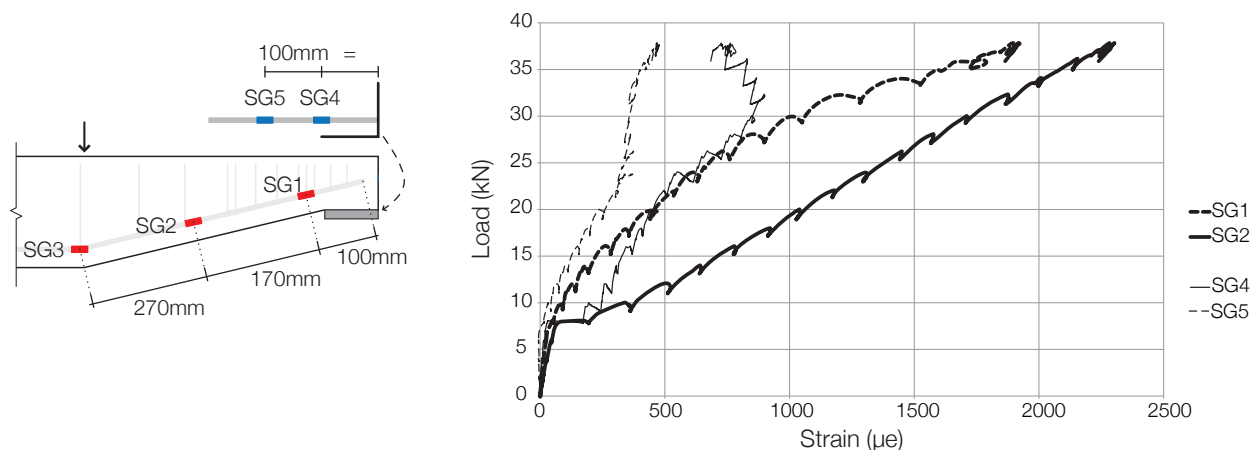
Bar strains, Beam 9\_2\_STM\_2(ii).
